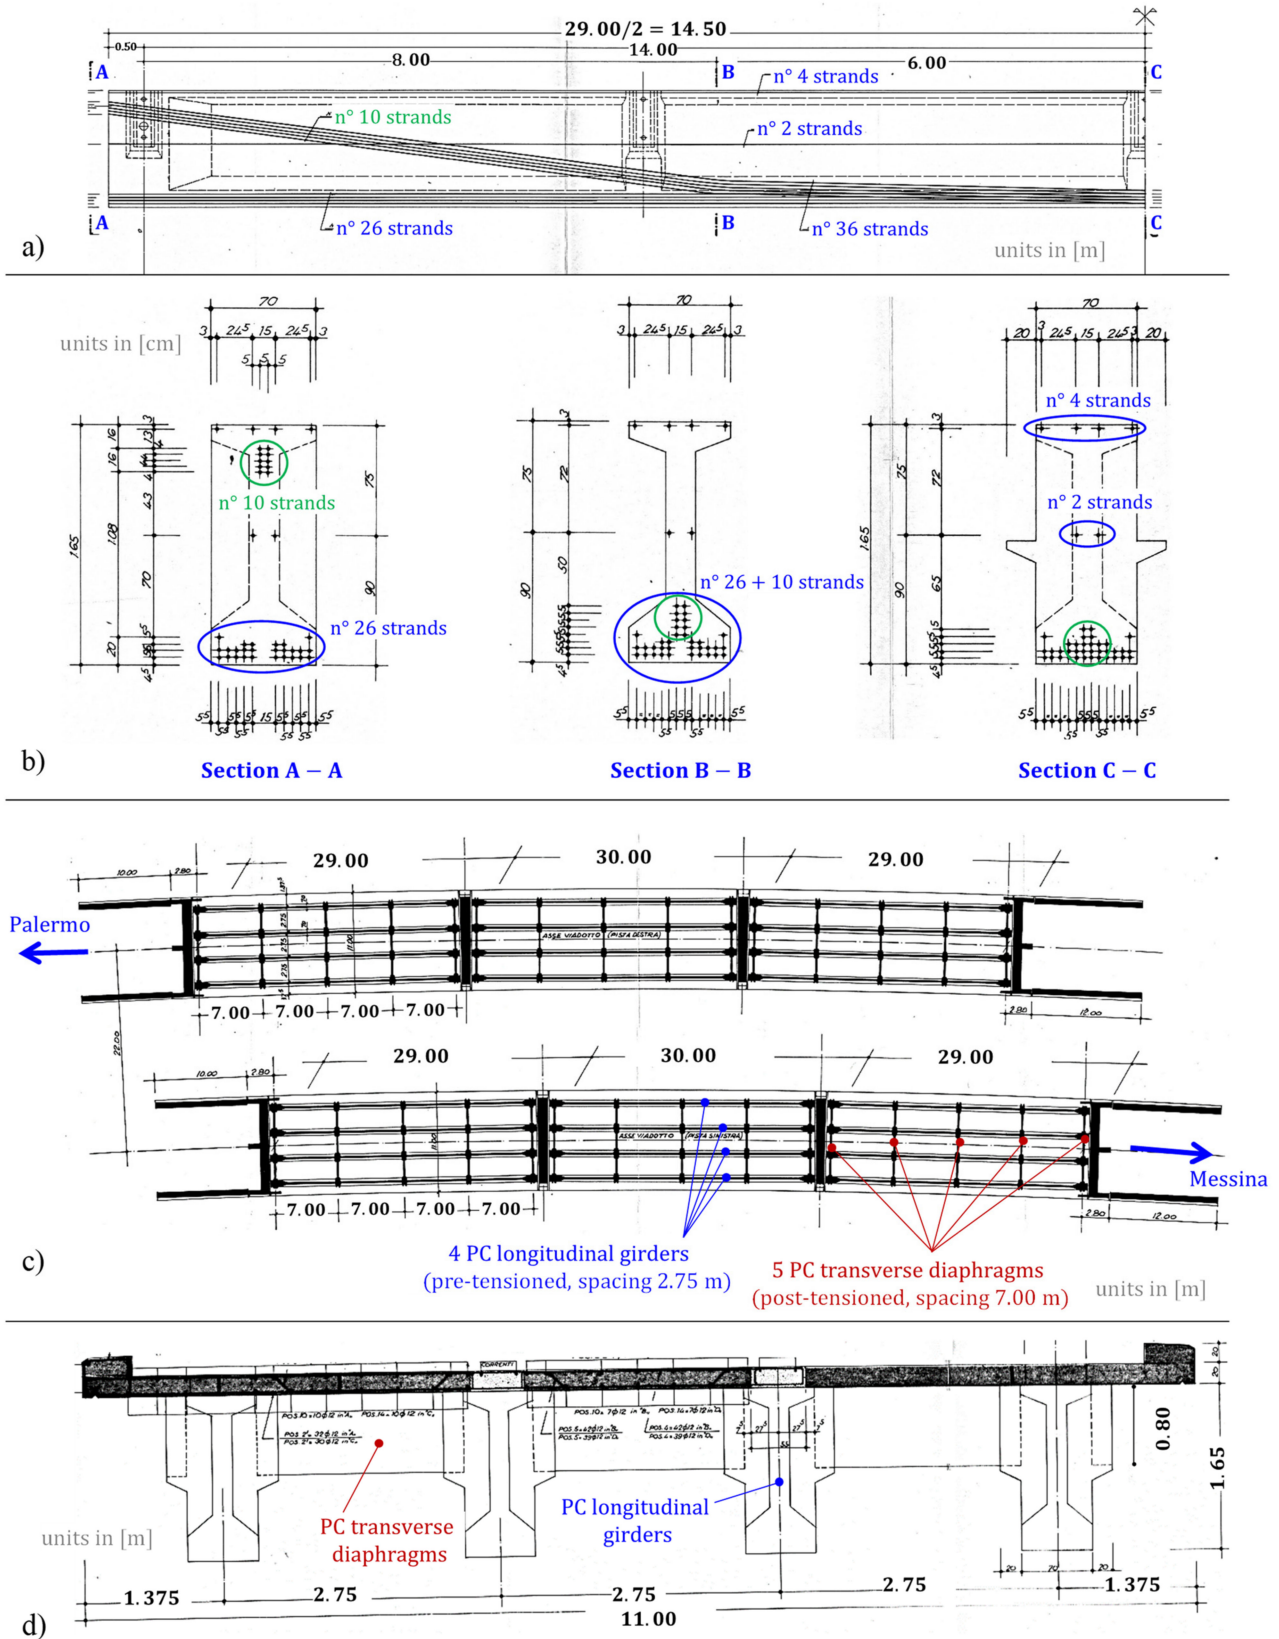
Original design drawings of the Longano viaduct: (a) configuration of the prestressing strands in longitudinal girders; (b) cross-sections of PC girders; (c) horizontal section of the bridge deck (two independent roadways); (d) transverse section of the bridge deck.
